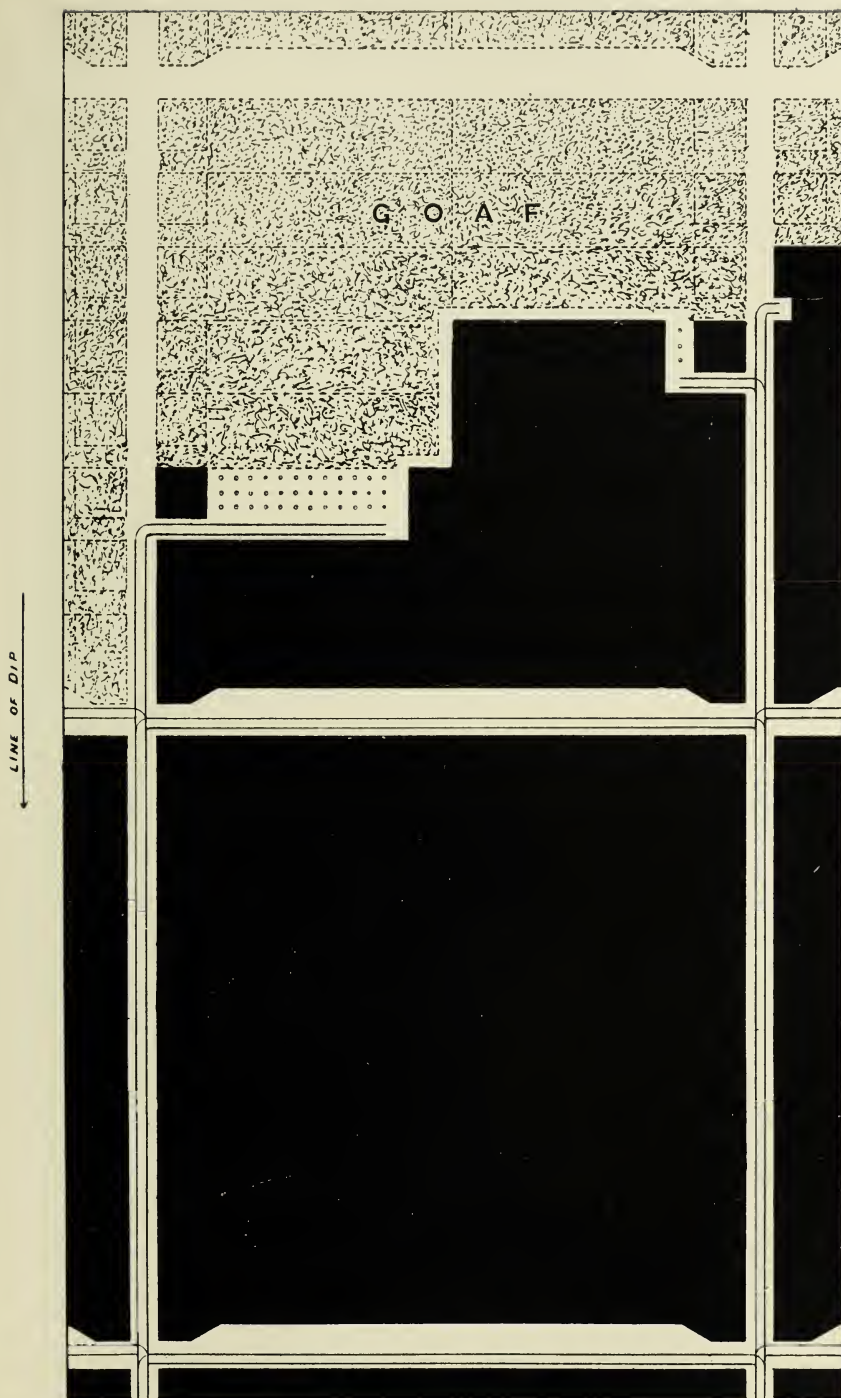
SILKSWORTH COLLIERY, SUNDERLAND, SOUTH DURHAM. PLAN SHOWING PILLAR WORKING UNDER A GOOD ROOF IN THE MAUDLIN SEAM.
